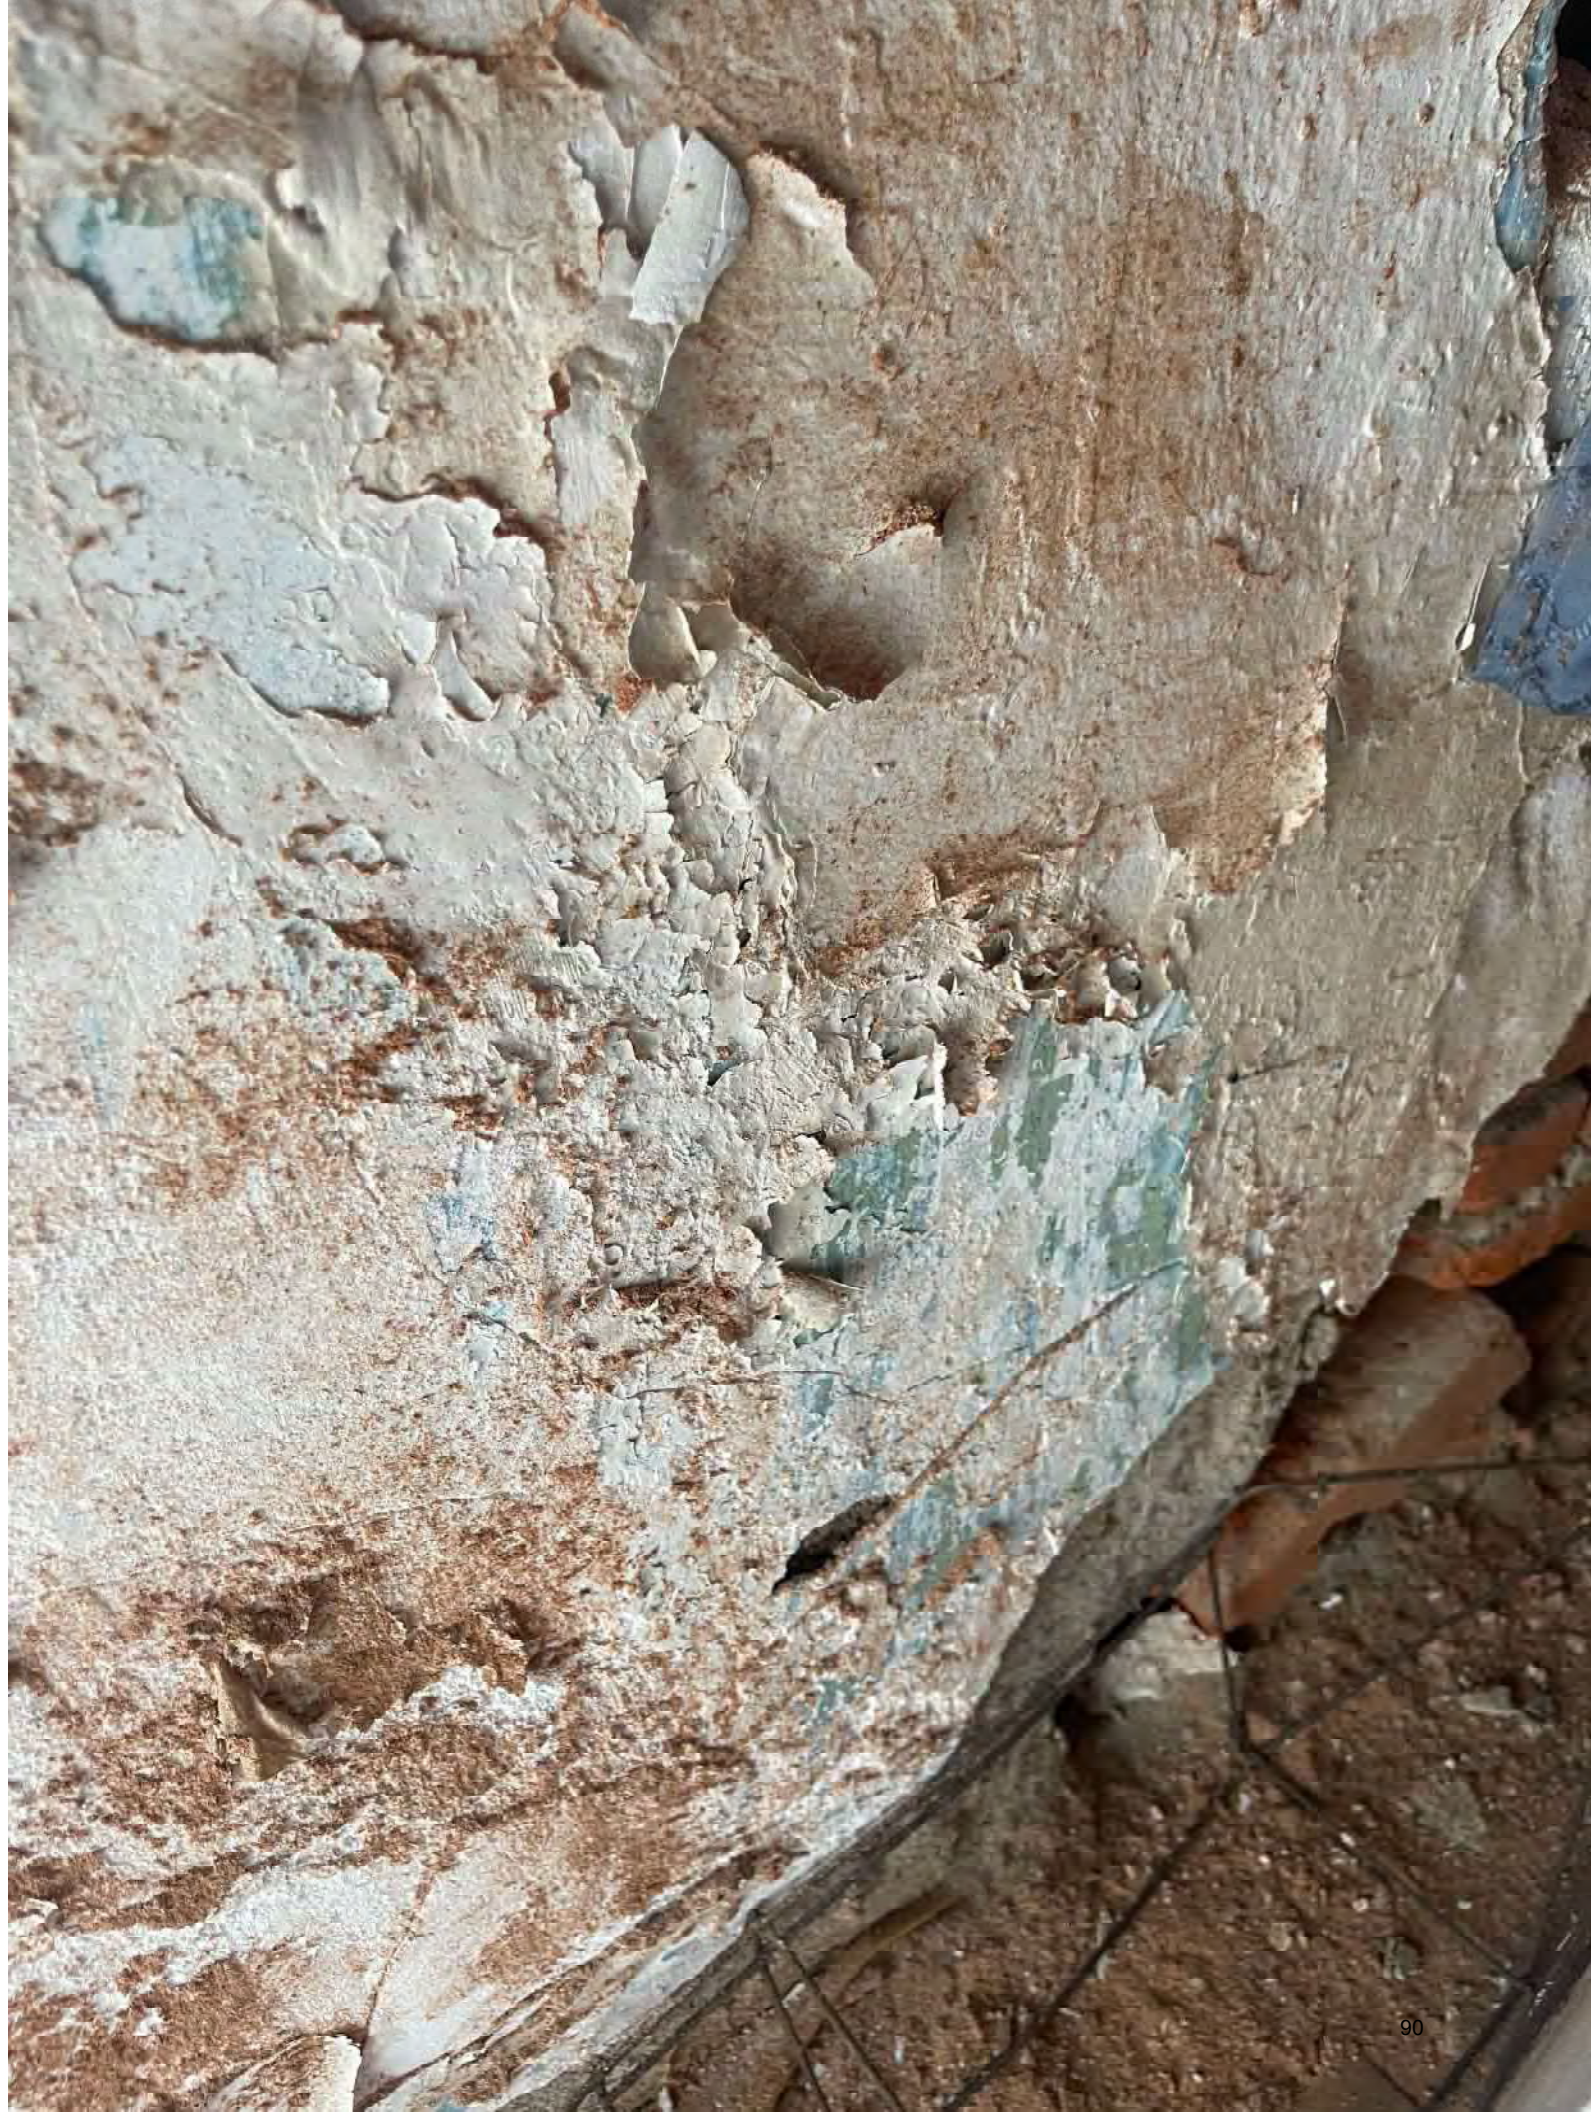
top of window on the front facade of the building showing full thickness cracks in the building as well as severely deteriorated bricks.
